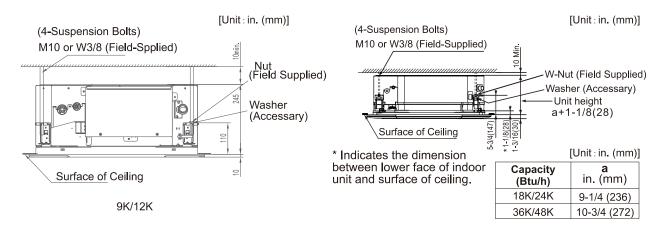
Mounting Position [Unit: in. (mm)]
